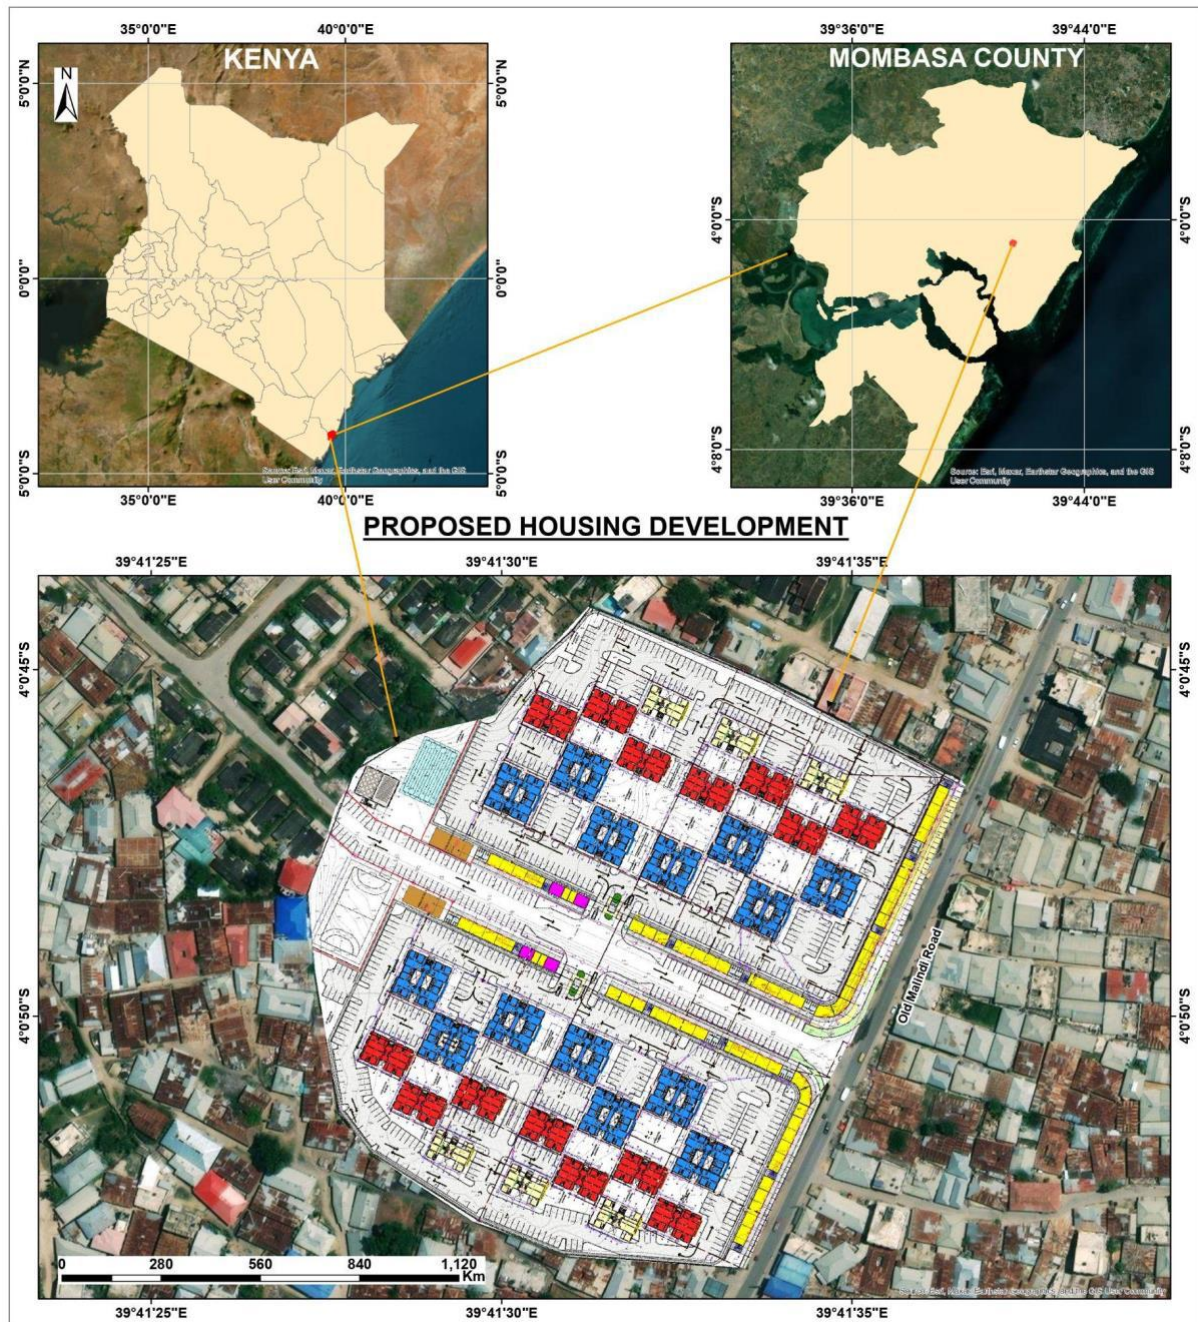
Project location & site layout plan of the proposed Kisauni residential development
